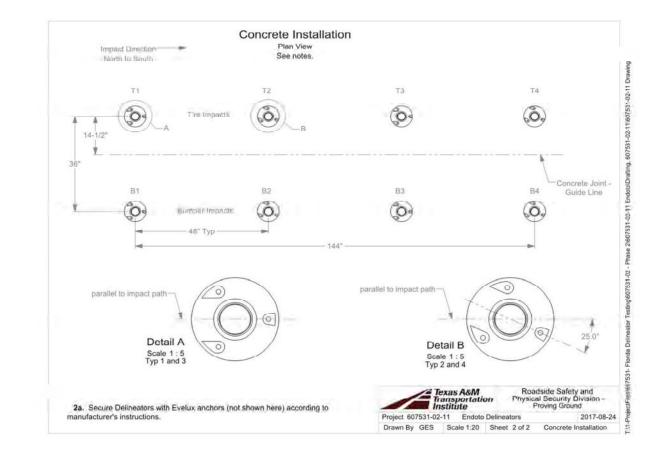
607531-02-11 Test Setup Details on Concrete Surface (Mechanical Anchors).
